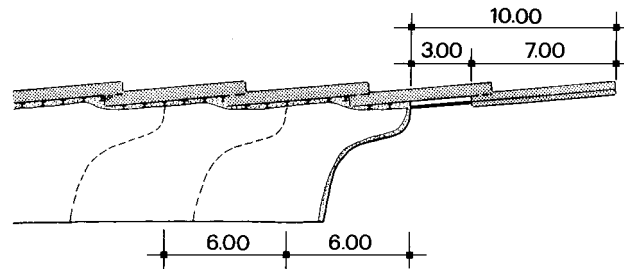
Longitudinal section of the tunnel showing the overlap existing between subsequent arches of sub-horizontal jet-grouted columns
